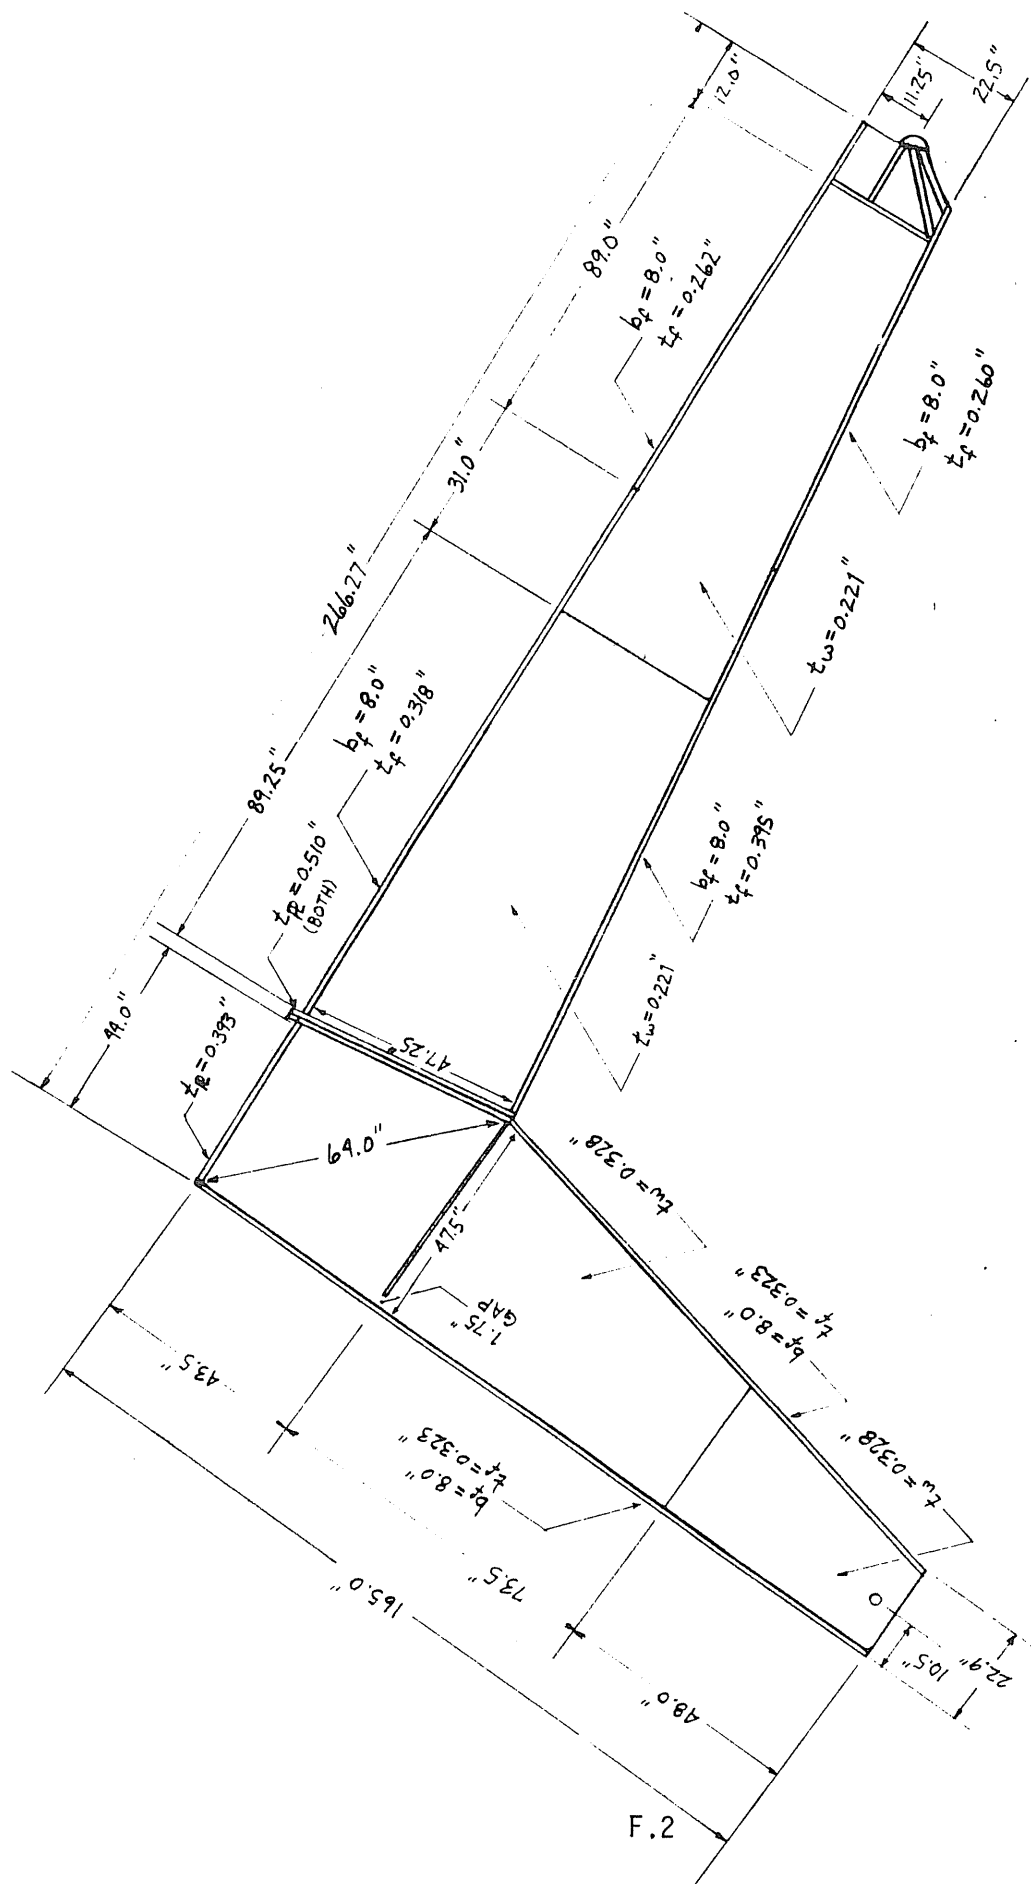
SPECIMEN DETAILS, TEST FA-6
